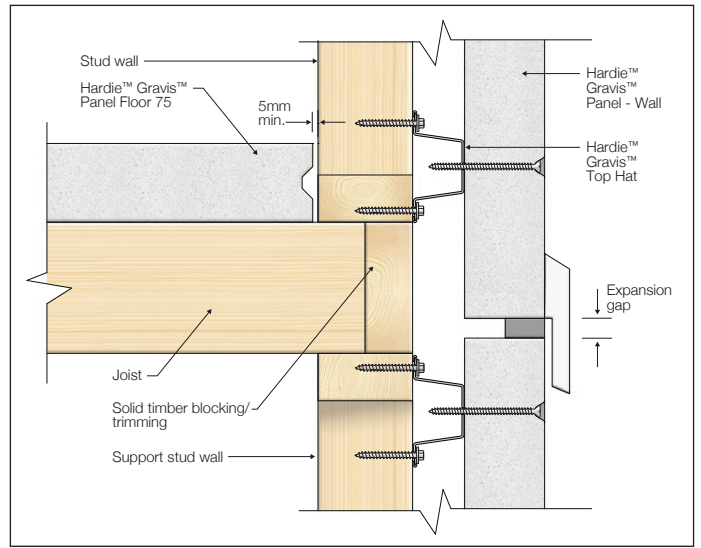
FITTED FLOOR BEARING BLOCKING
